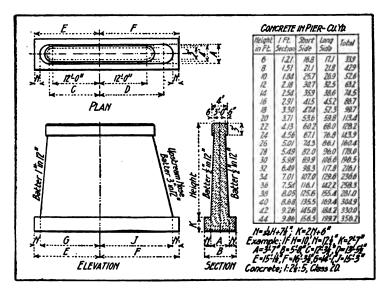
Standard Masonry Piers. Michigan State Highway Commission.
